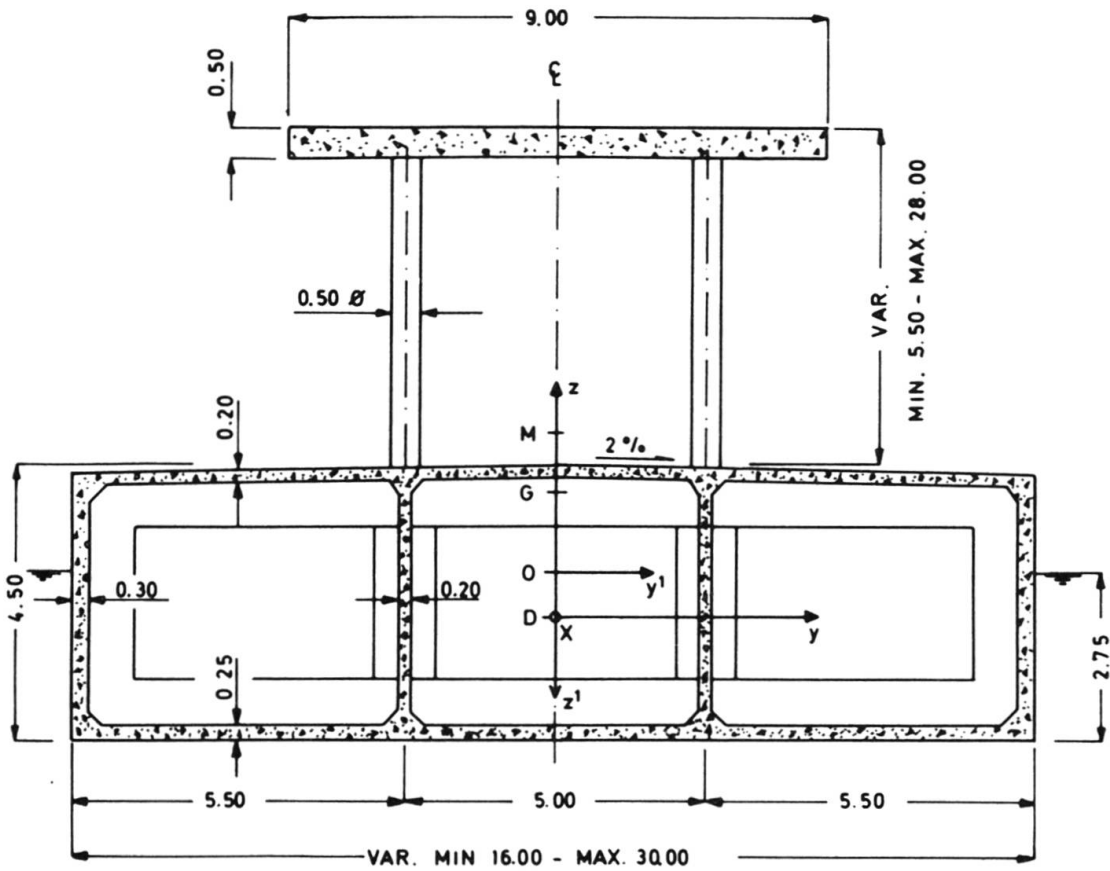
CROSS-SECTION. DIMENSIONS IN m
